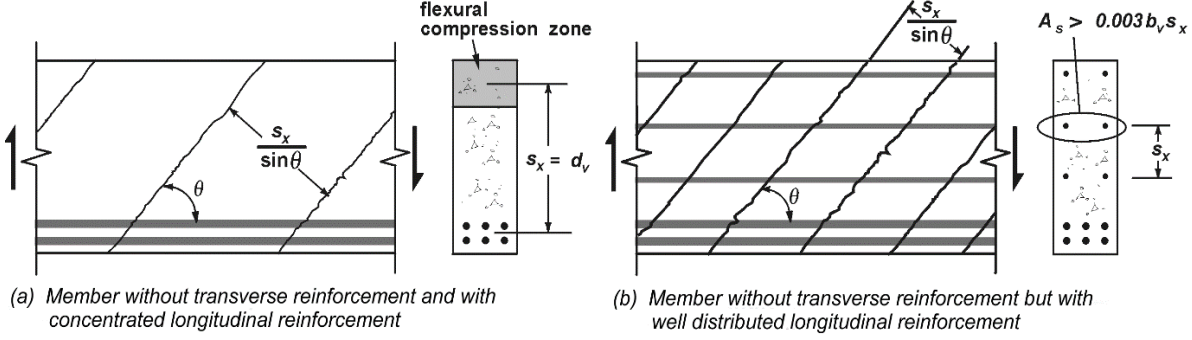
Determining the crack spacing parameter s_x for girders with insufficient transverse reinforcement [62]
